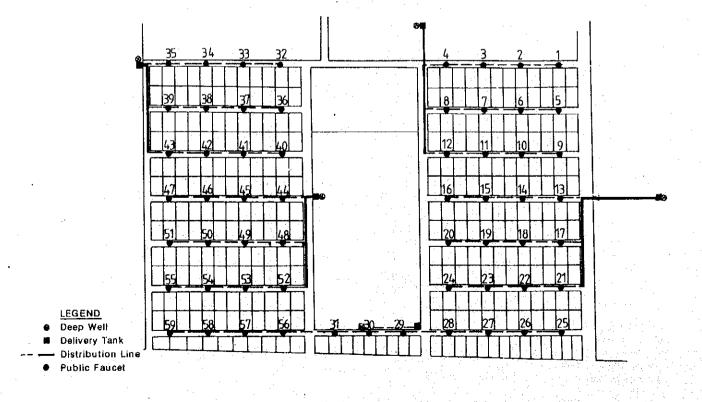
Alternative Plan of Pipe Line Alignment (Case-III)
